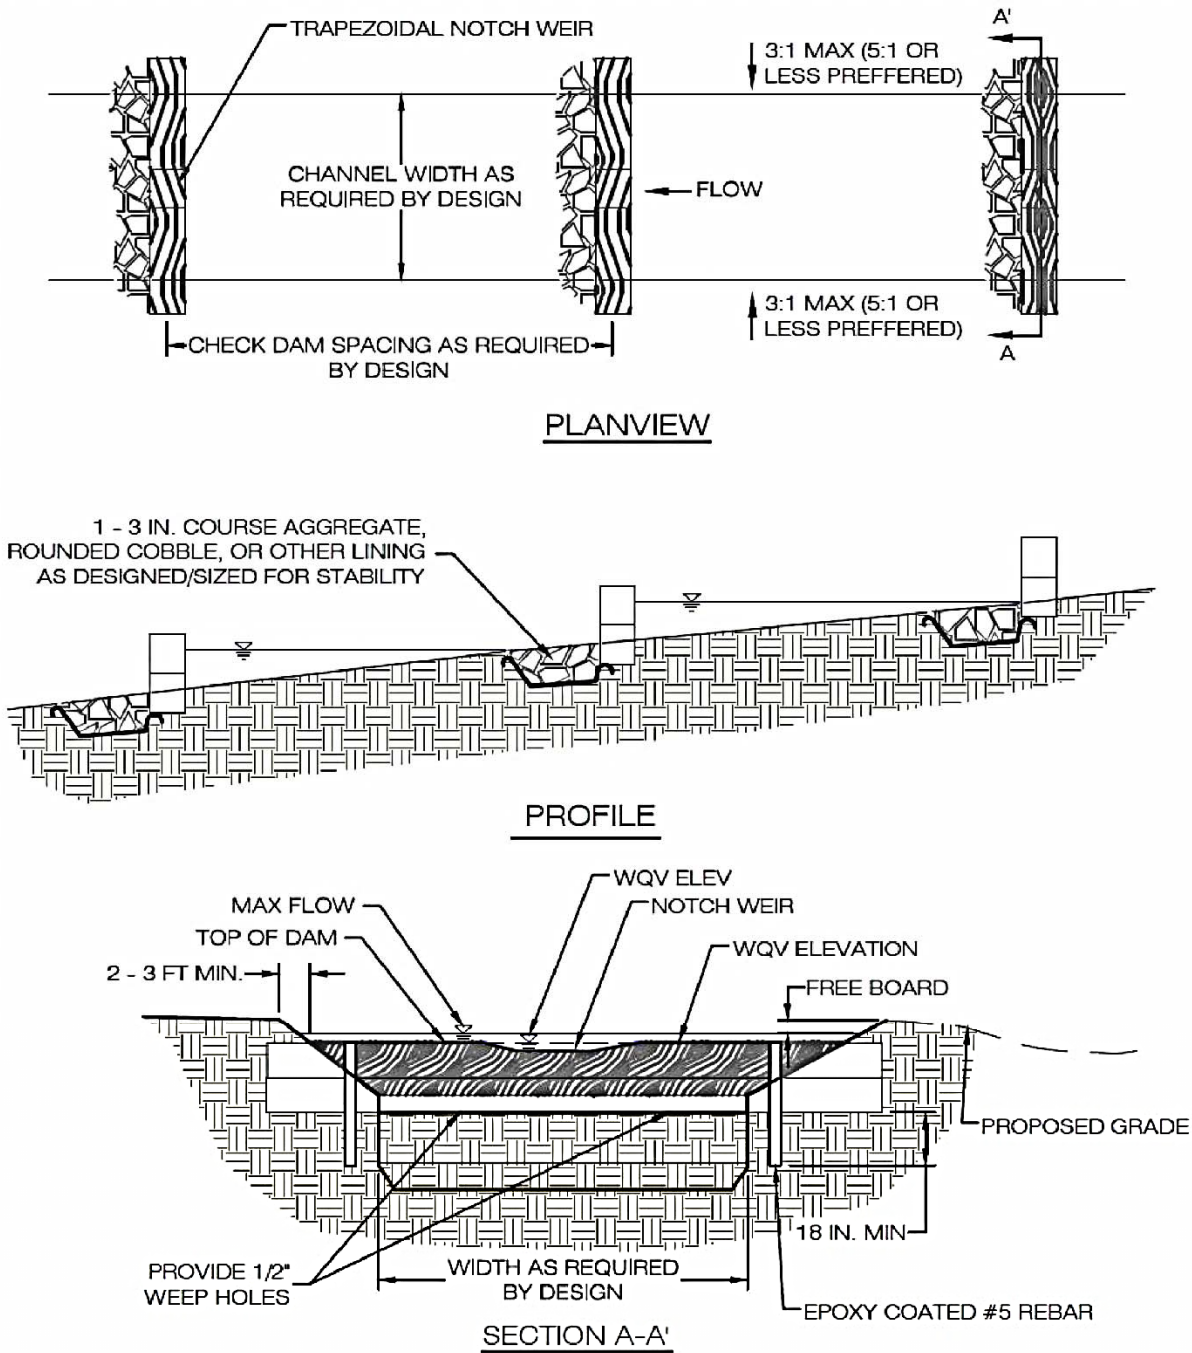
Grass Channel along Roadway – Typical Plan, Profile and Section
